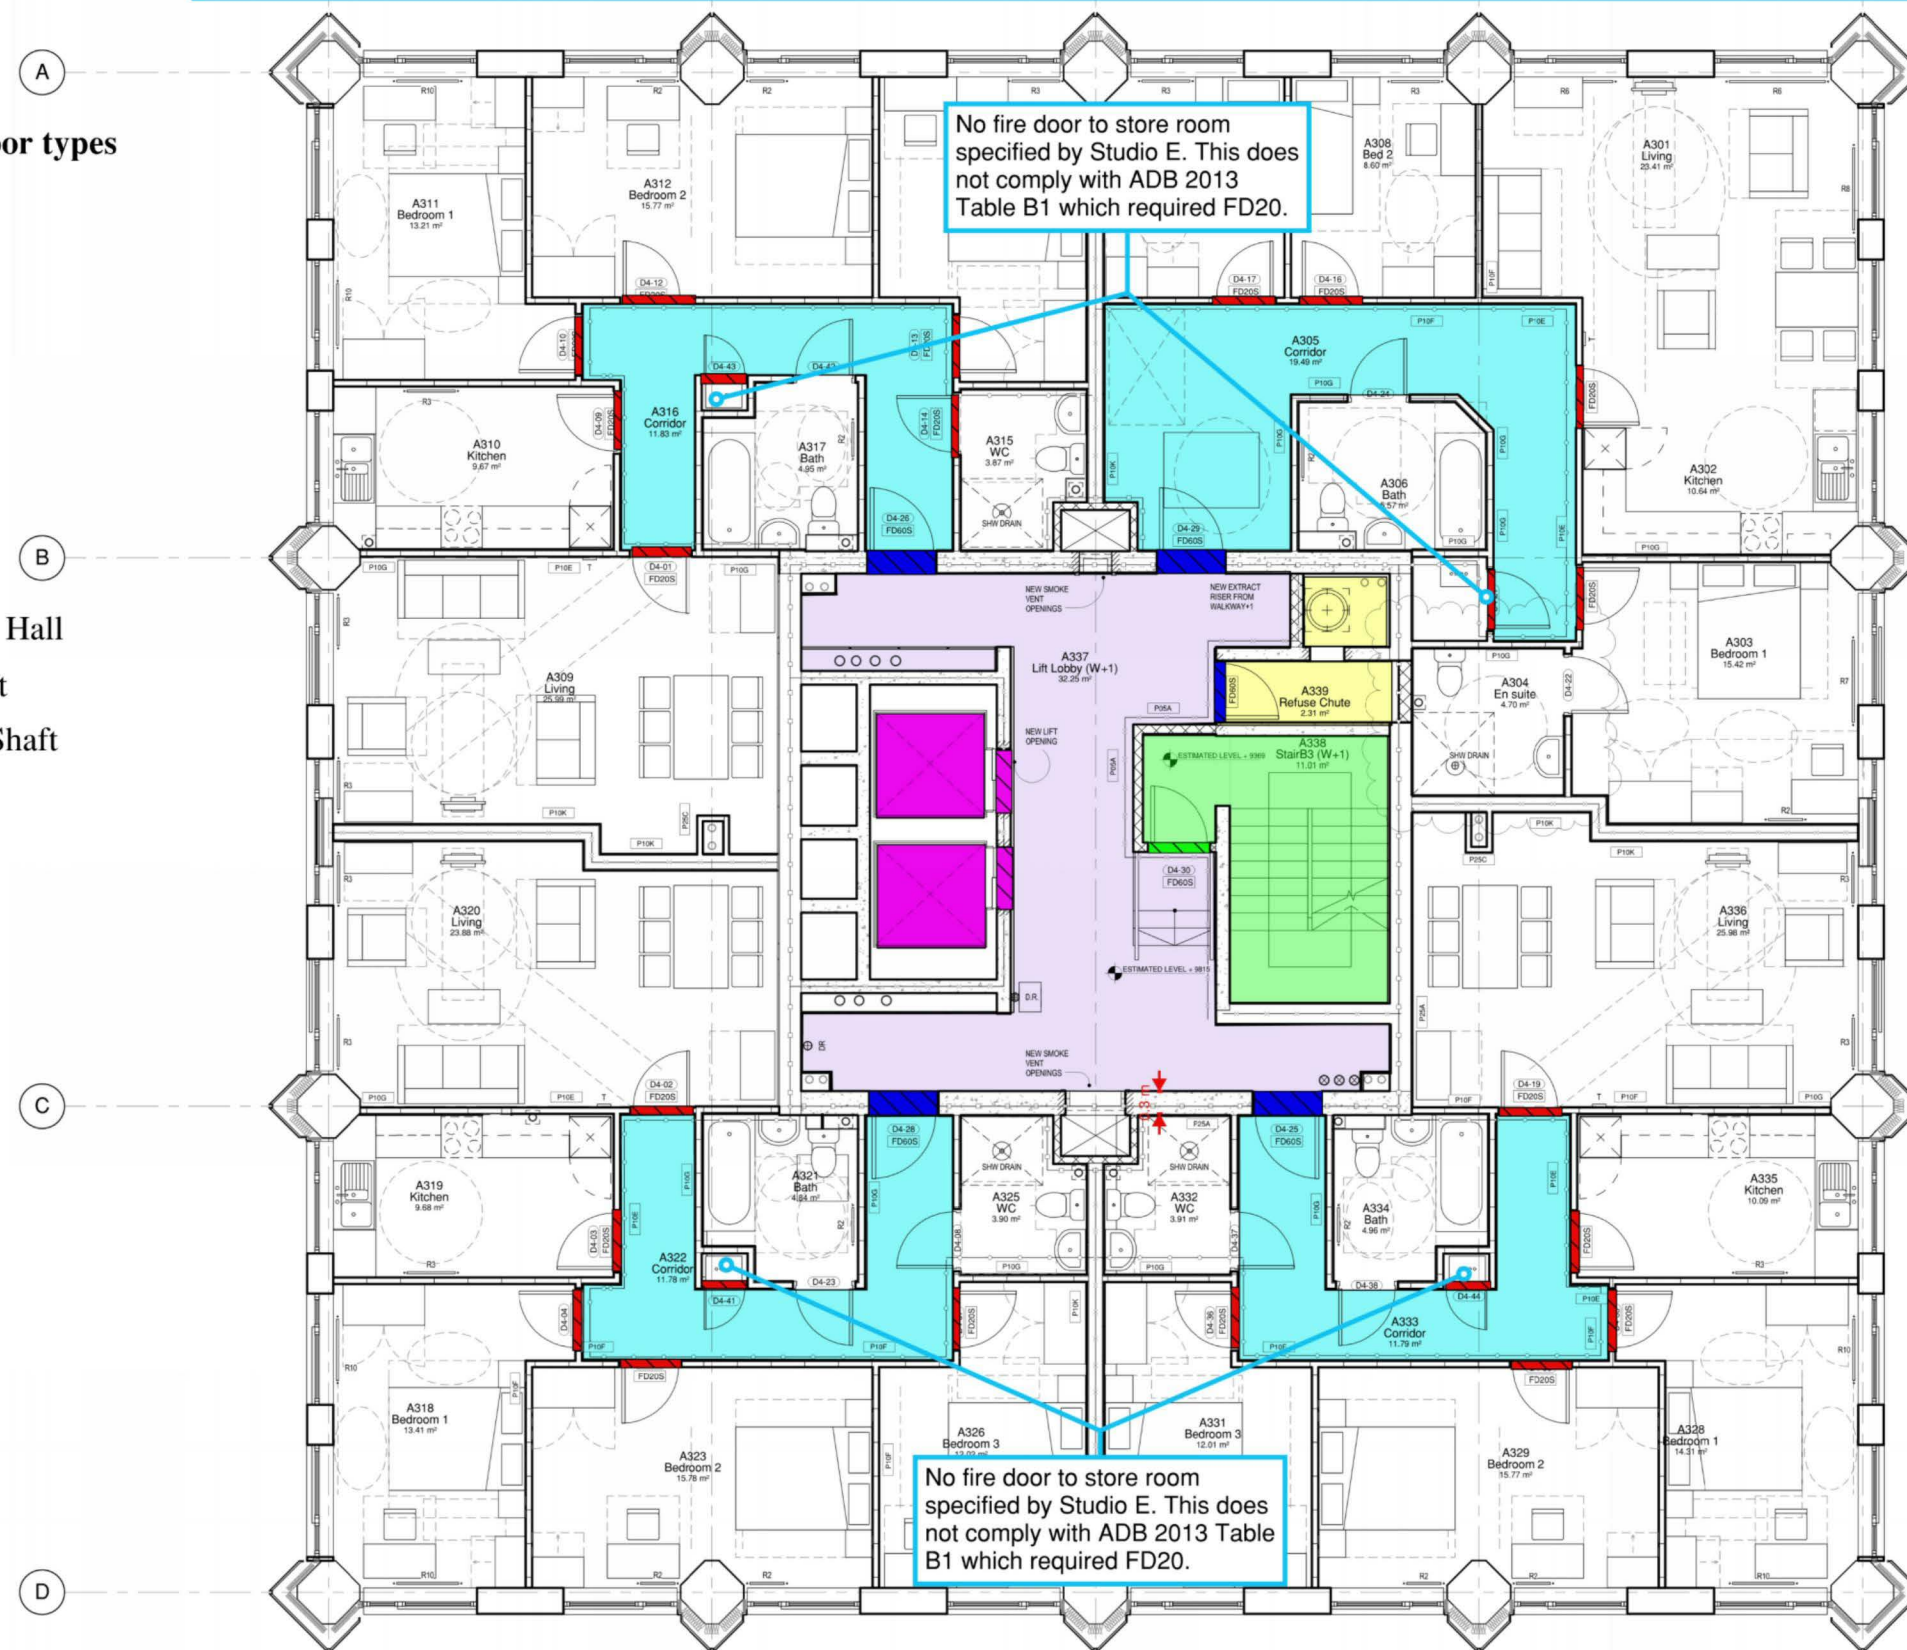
Indicative over marking of ADB 2013 compliant fire doors on the Studio E as built level 3 floor plan (SEA00003229)
